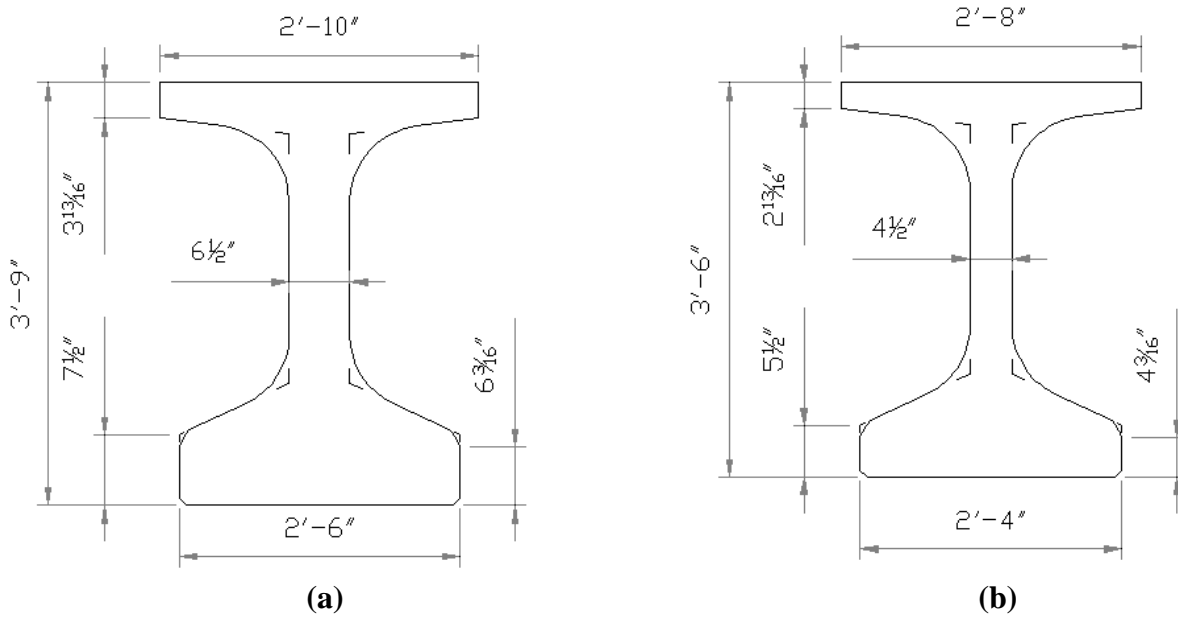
IDOT BTCHIO 45 in. (1.14 m) Girder: (a) Typical (b) Modified.
